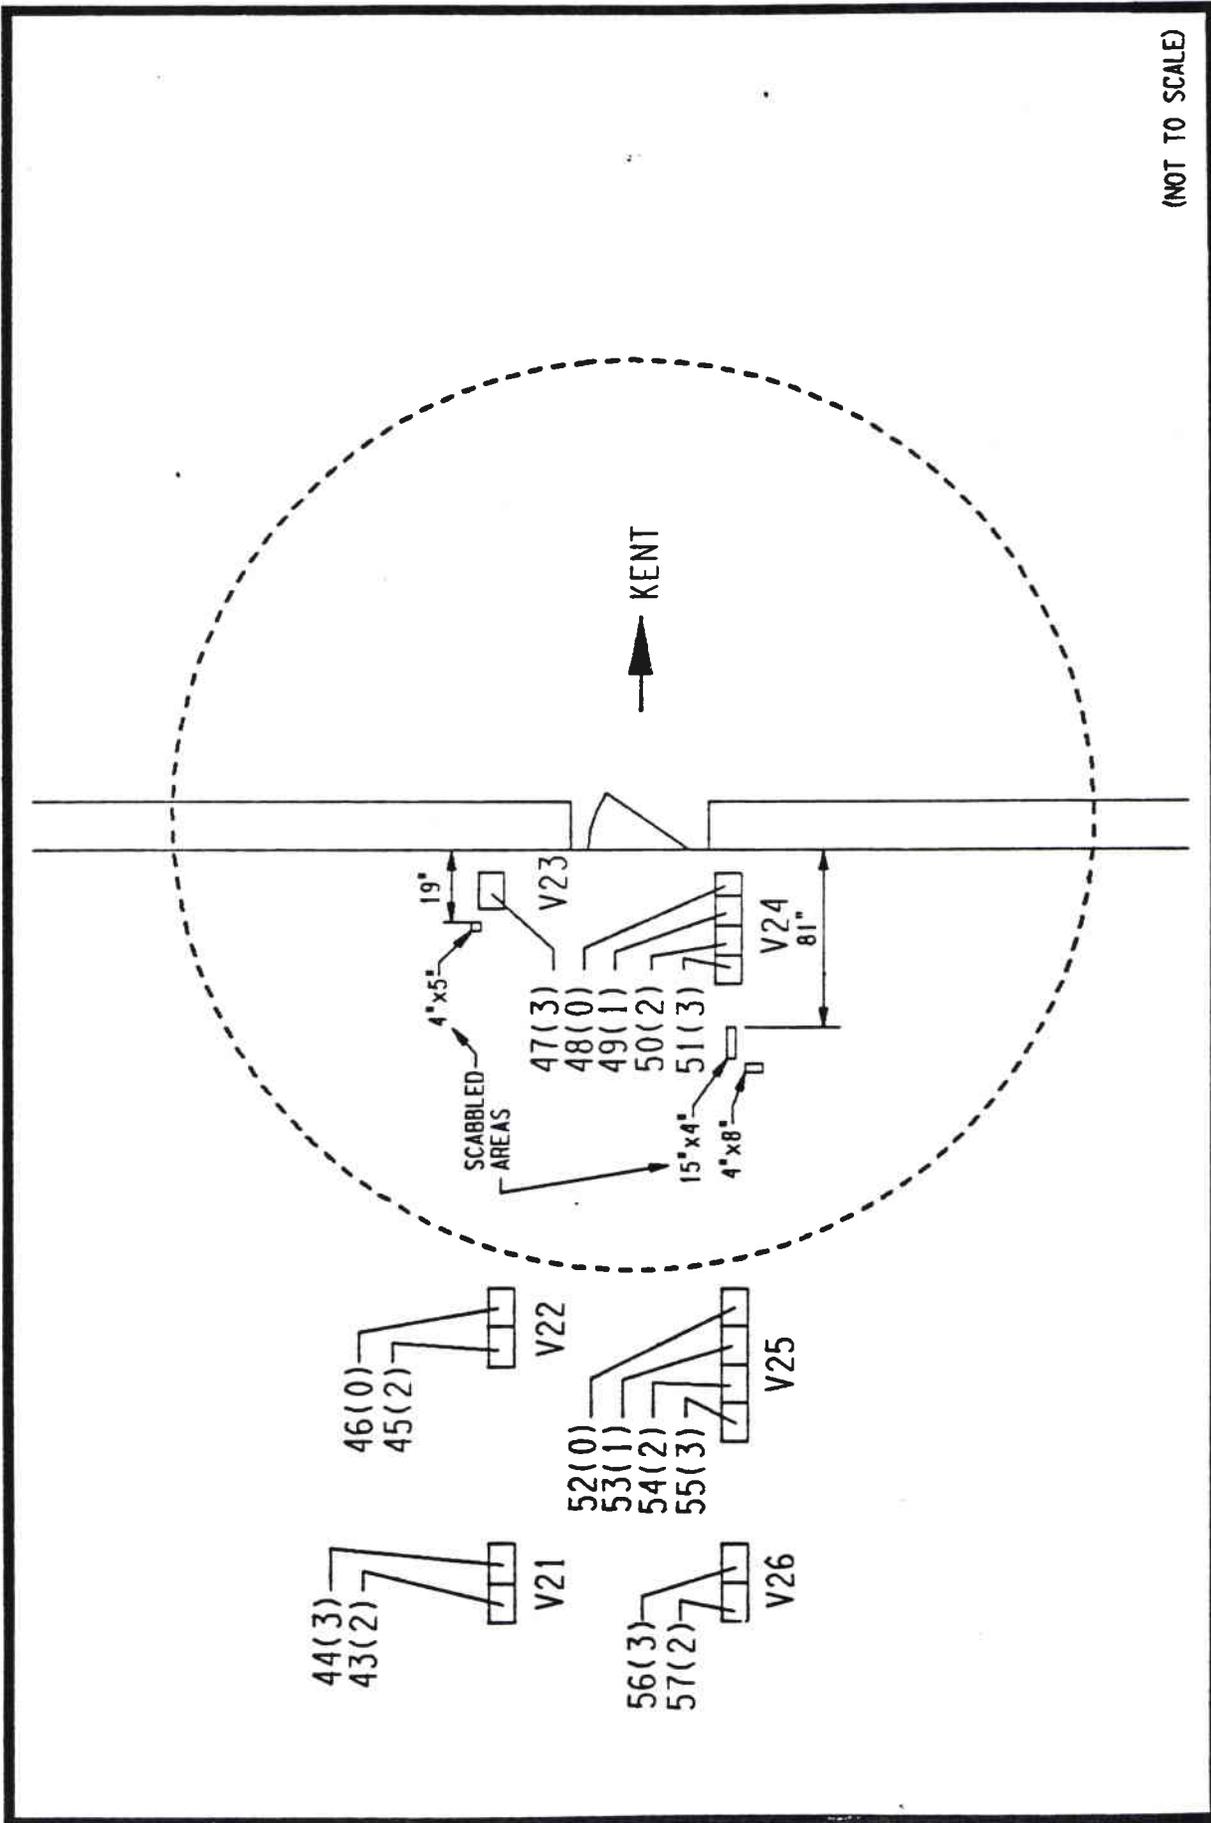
AREAS SCABBLED ON THE FOURTH FLOOR ATTIC FLOOR
